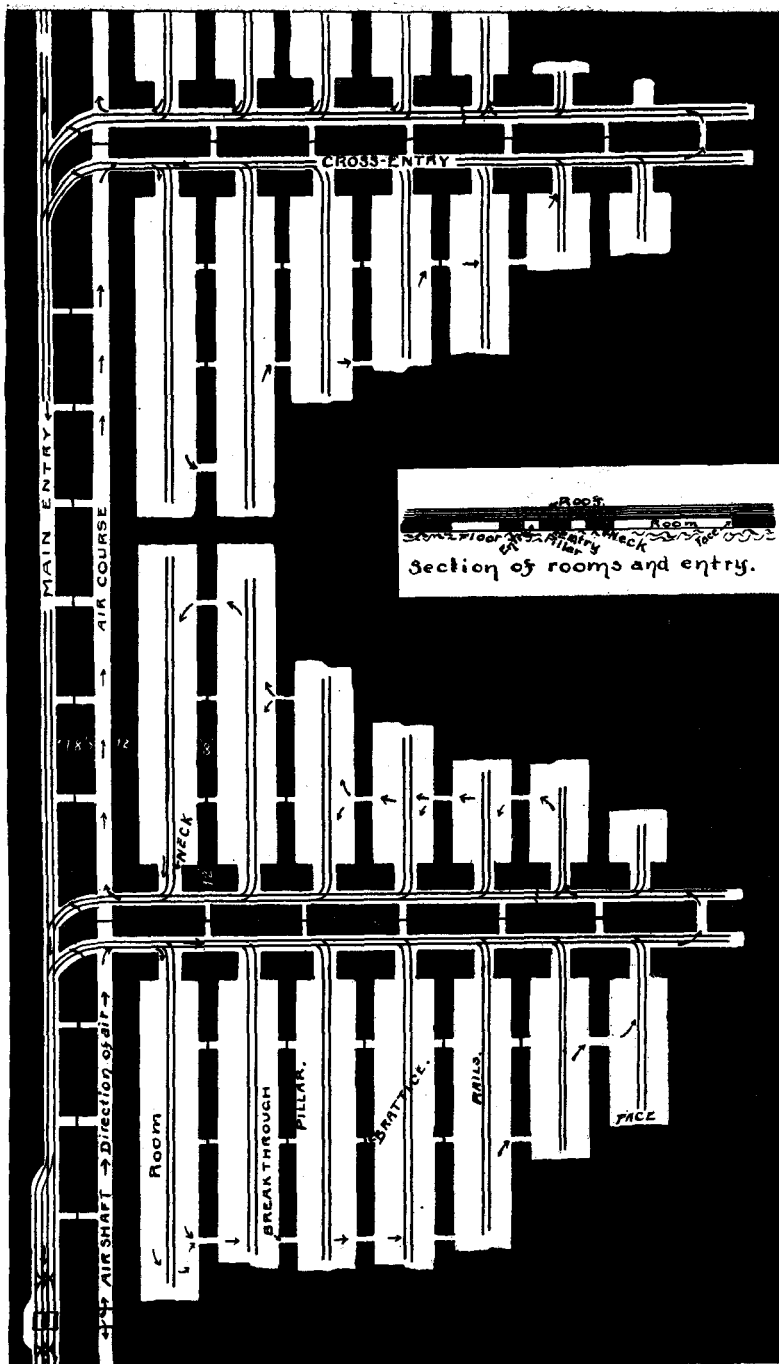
PLATE LXXXIV. Typical plan of room and pillar mine as commonly followed in Indiana.
